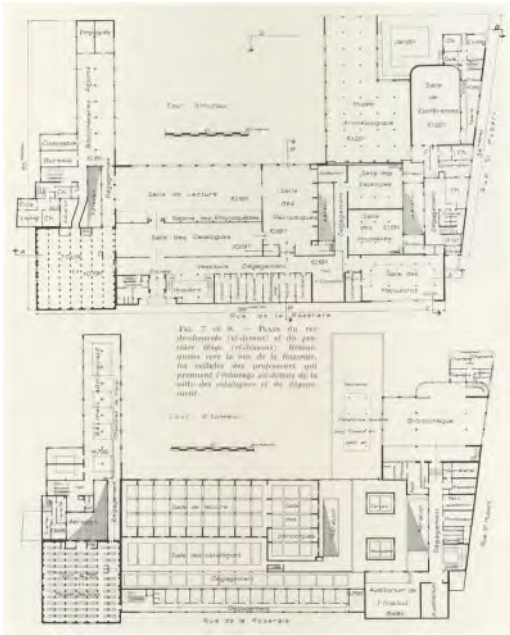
Plan of the ground level (above) and first floor (below) (*La Technique des Travaux*).
